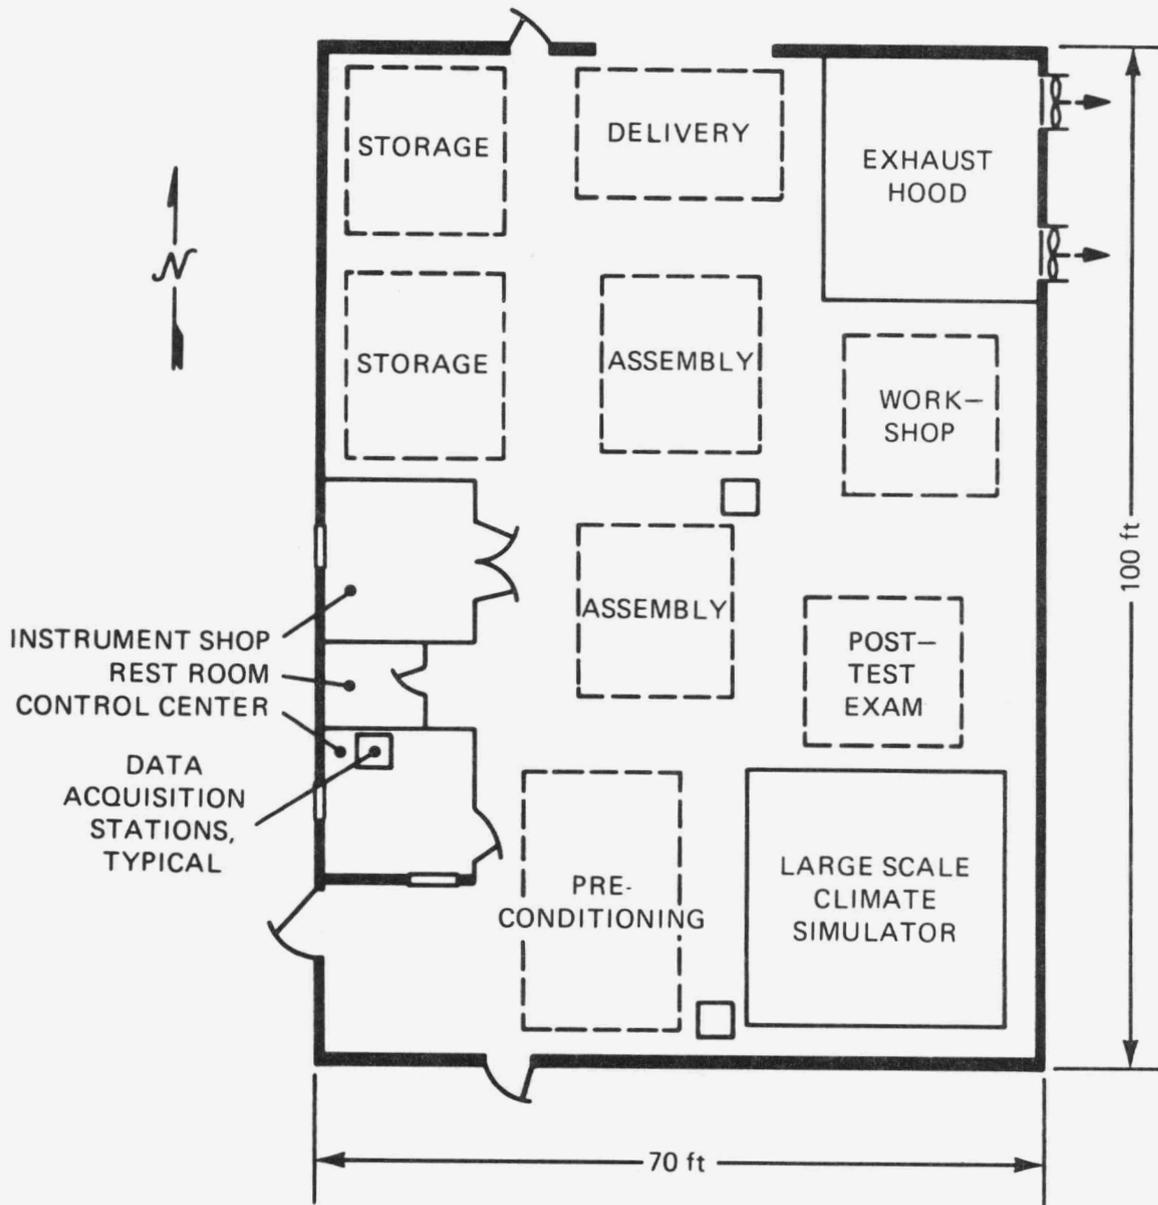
Equipment layout for Building 3144 at the Roof Research Center.
